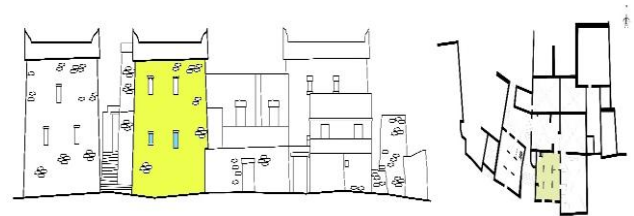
Floor plan and south facade of Al Dhafeer Historical Village building. Source: The author
